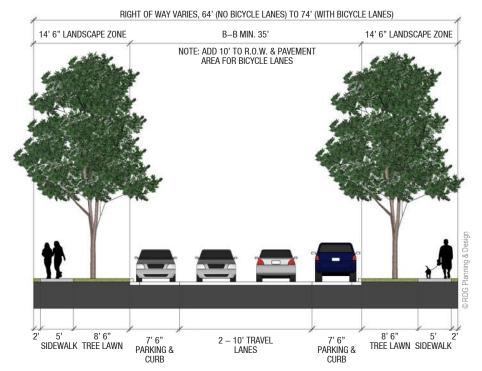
SECTION - TYPICAL LOCAL STREET, TYPE B
